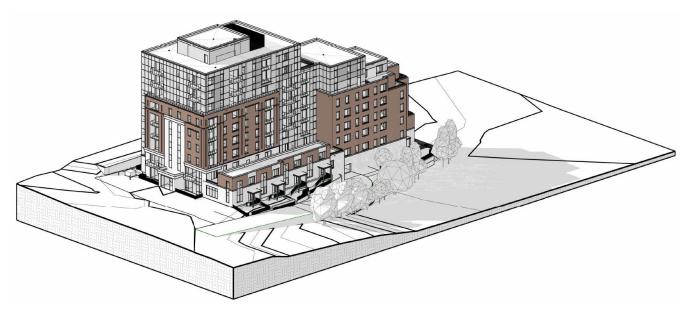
Building Cross Section Showing South and East Facades (Coloured).
